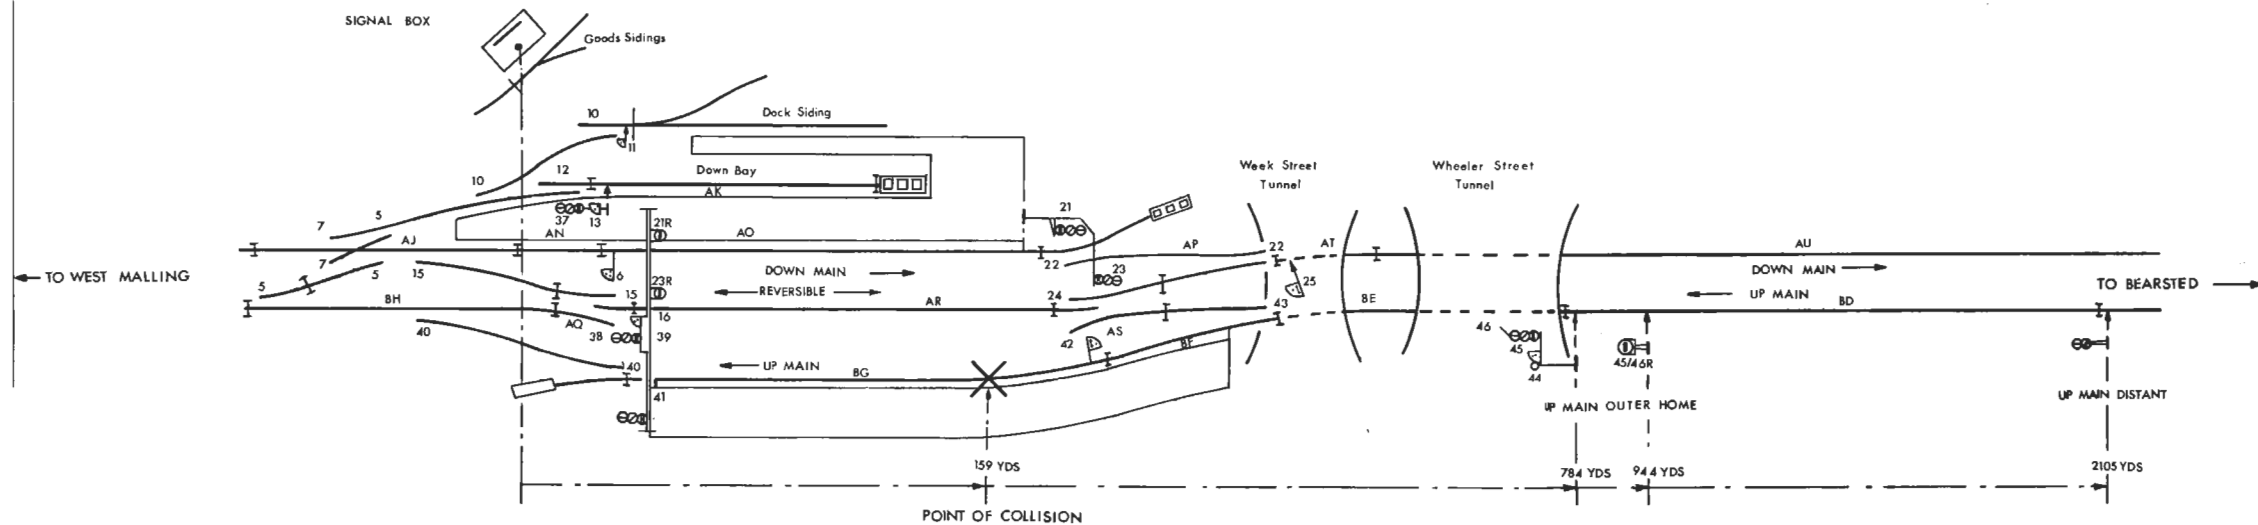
FIGURE I MAIDSTONE EAST SIGNALLING AND TRACK LAYOUT
